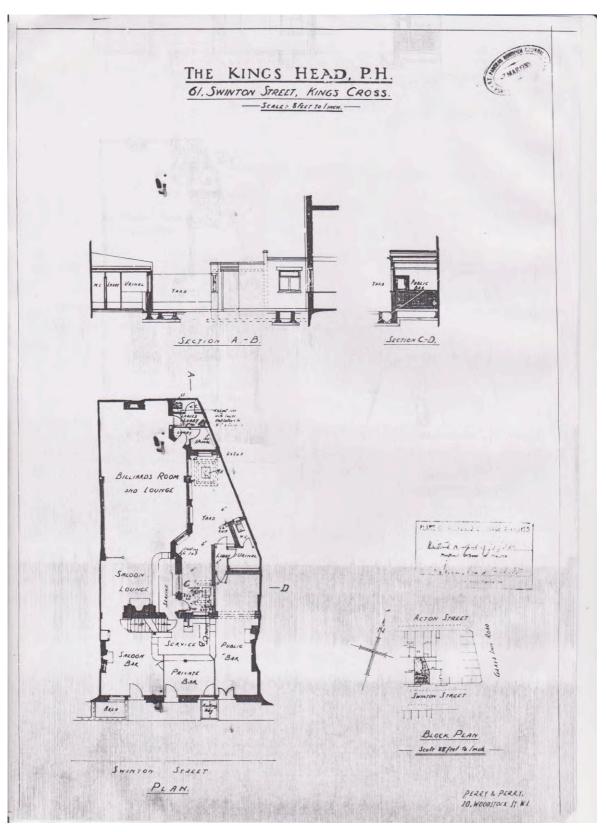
Ground floor plan of 61 Swinton Street in 1936 (Camden archives, drainage records)
